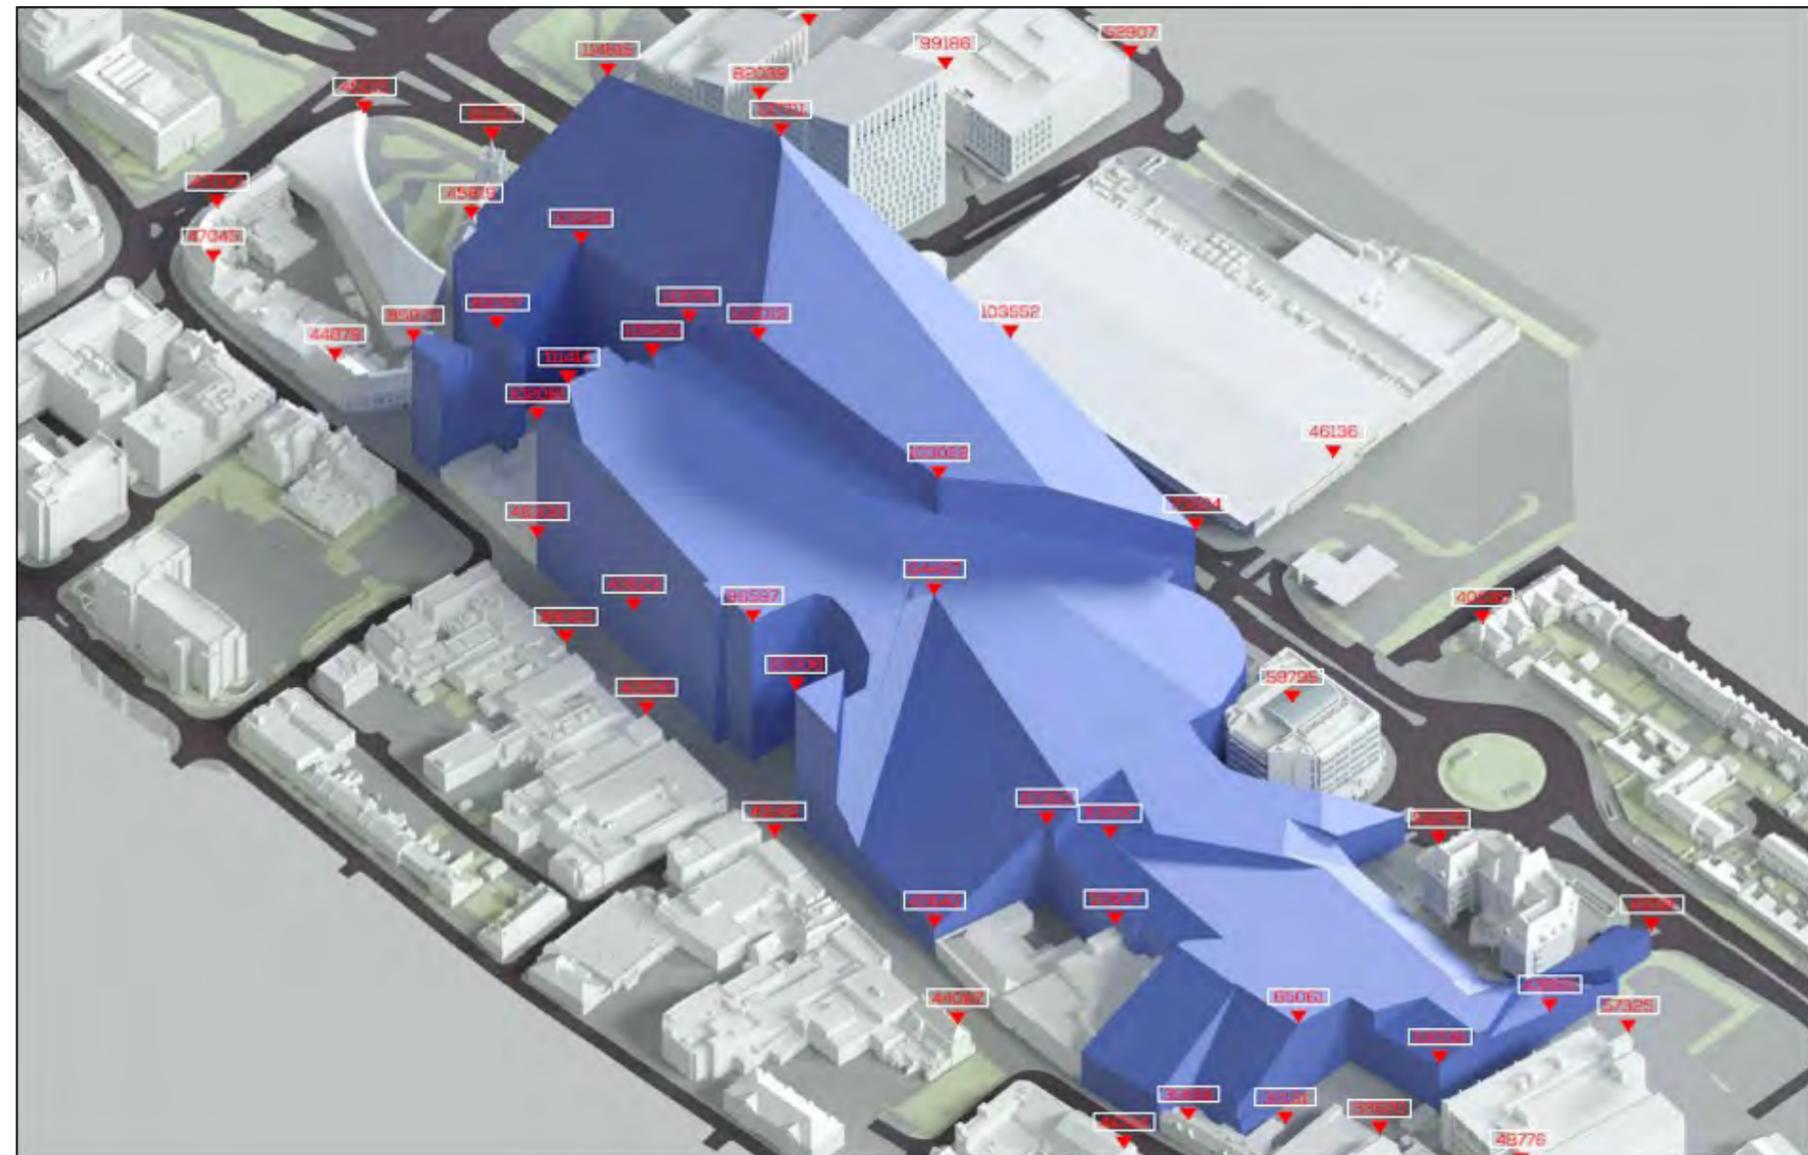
Daylight and Sunlight Envelope Study - Existing Jelly Mould
